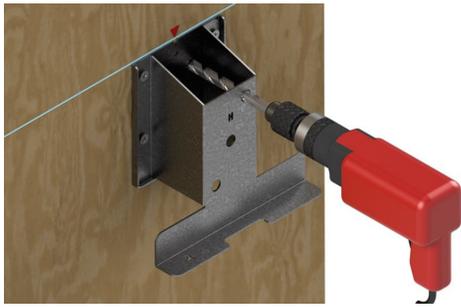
DRILL BOLT HOLES USING BRACKET AS GUIDE
